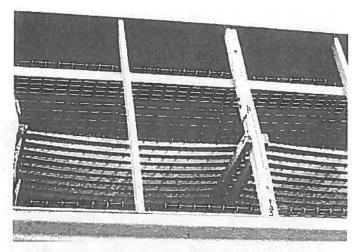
Pipes entering Cooling Towers 1 and 2, camera facing west.
